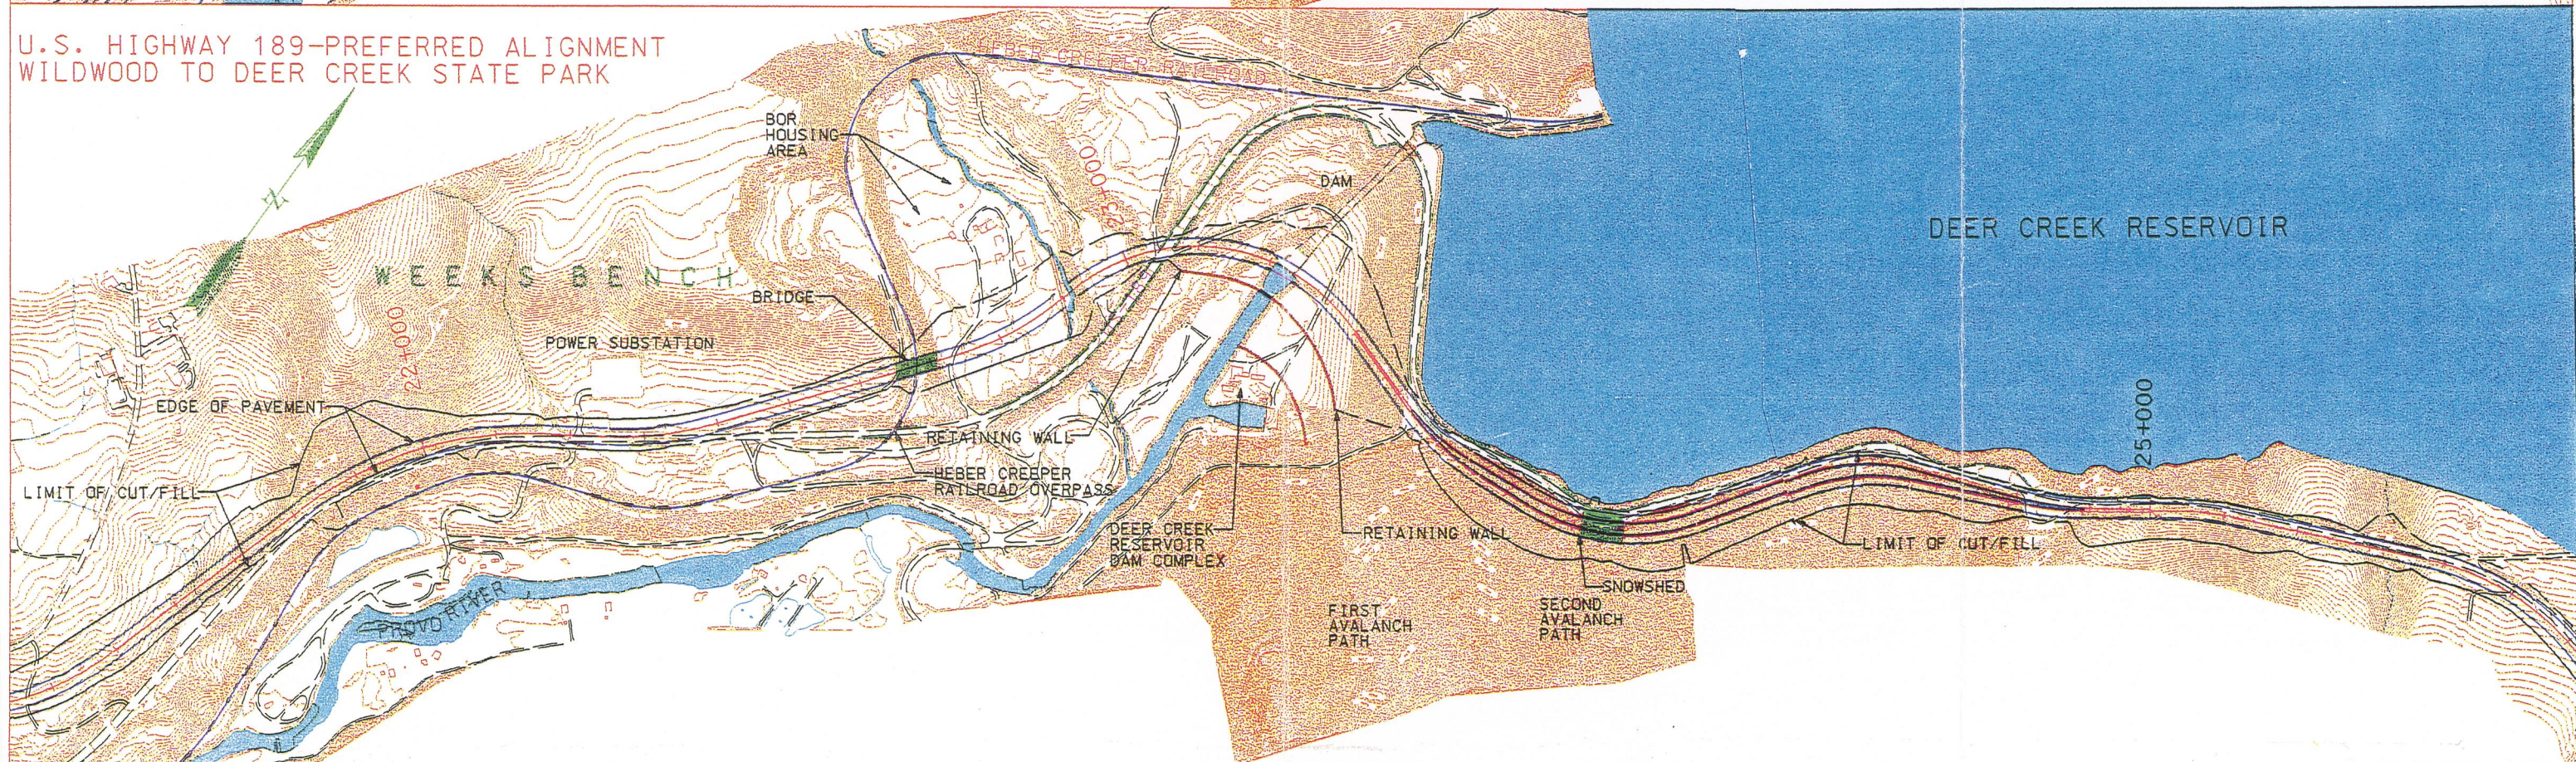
Section 3 of Wildwood to Deer Creek State Park Segment, Provo Canyon Highway Improvement Project.
